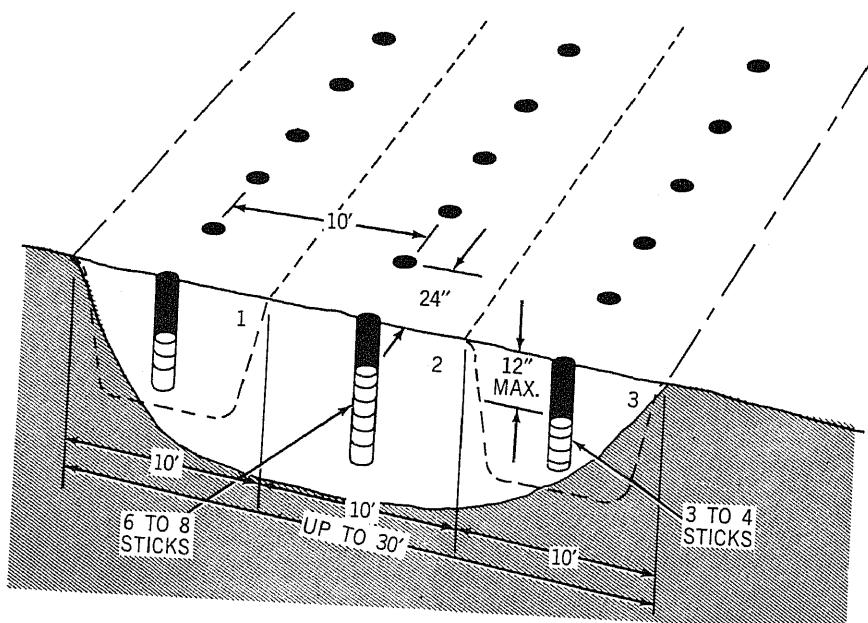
Relief method of loading for shallow ditches. Ditches 1 and 3 are blasted first to relieve the charge in ditch 2.
